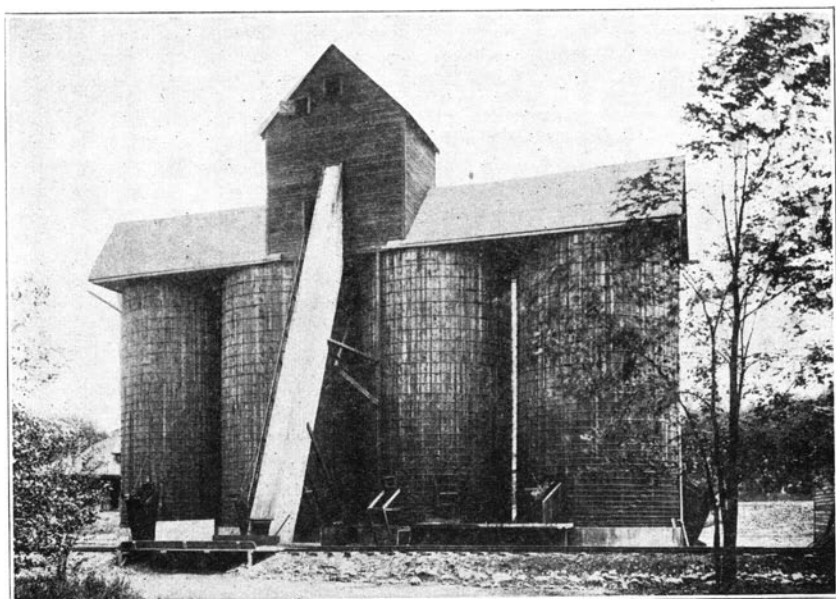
WOODEN STAVE SILO COAL STORAGE PLANT
